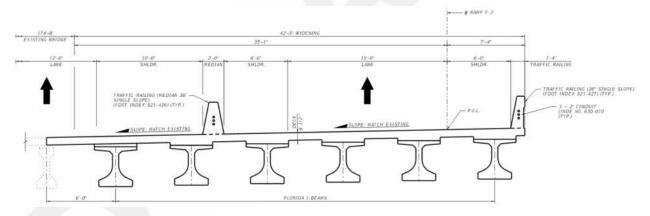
Bridge Typical Section (Bridge No. 17)
